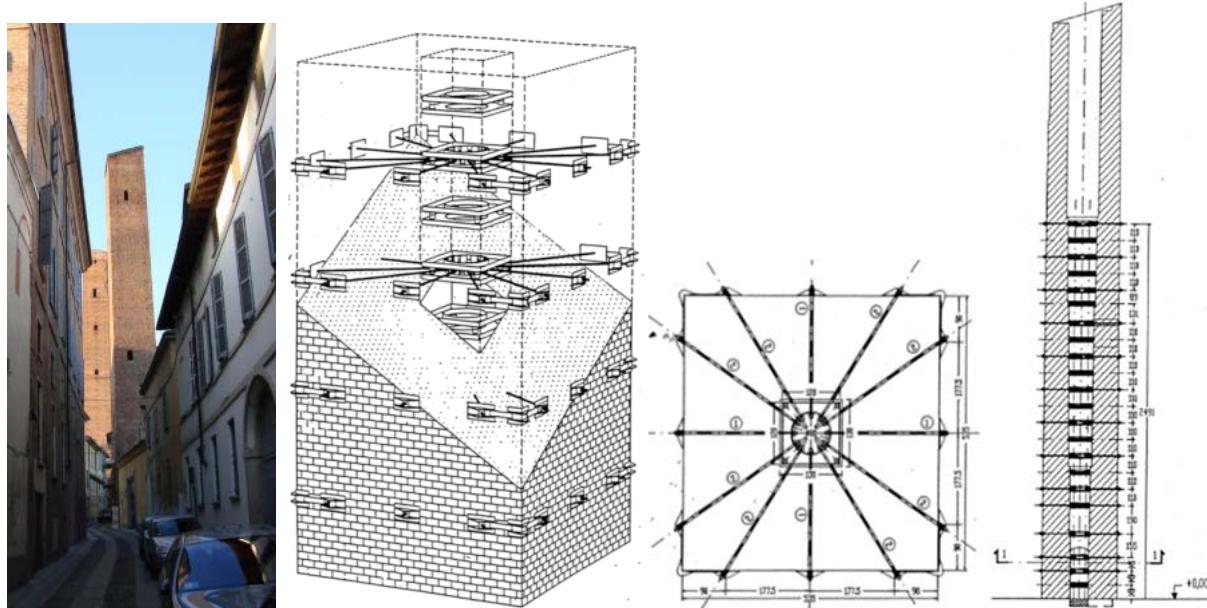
Details of intervention at Fraccaro Tower in Pavia, Italy for circumferential confinement
